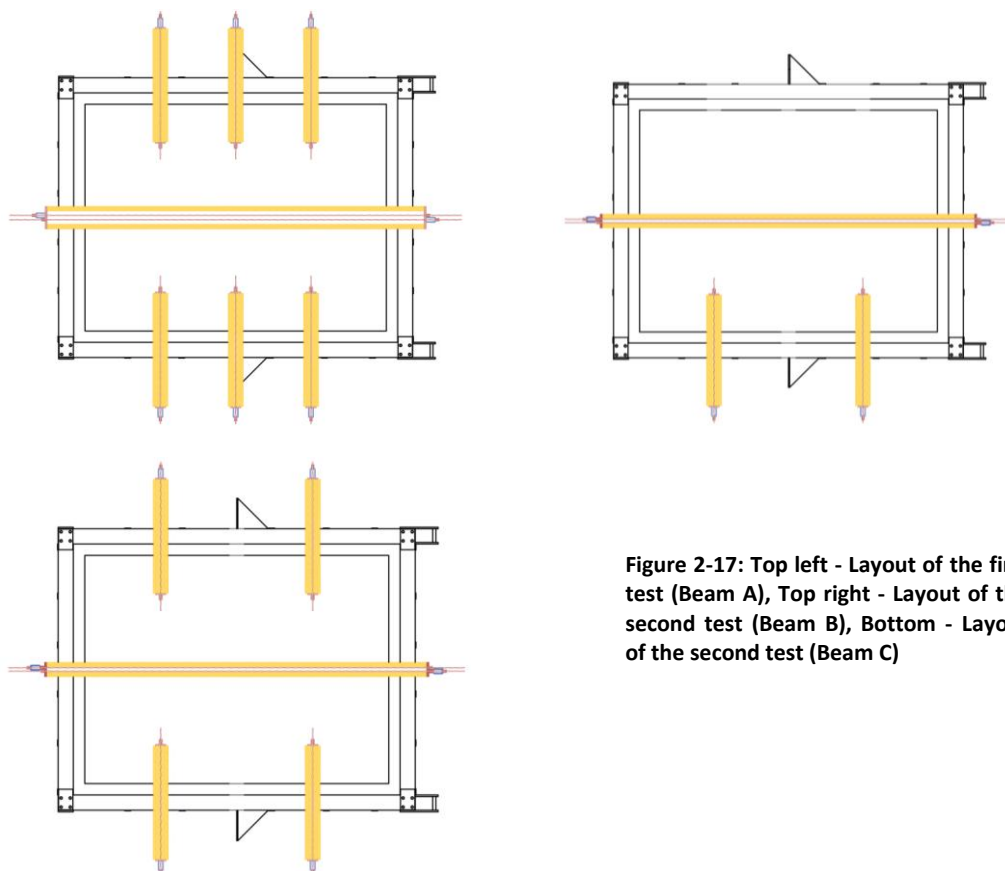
Top left - Layout of the first test (Beam A), Top right - Layout of the second test (Beam B), Bottom - Layout of the second test (Beam C)
